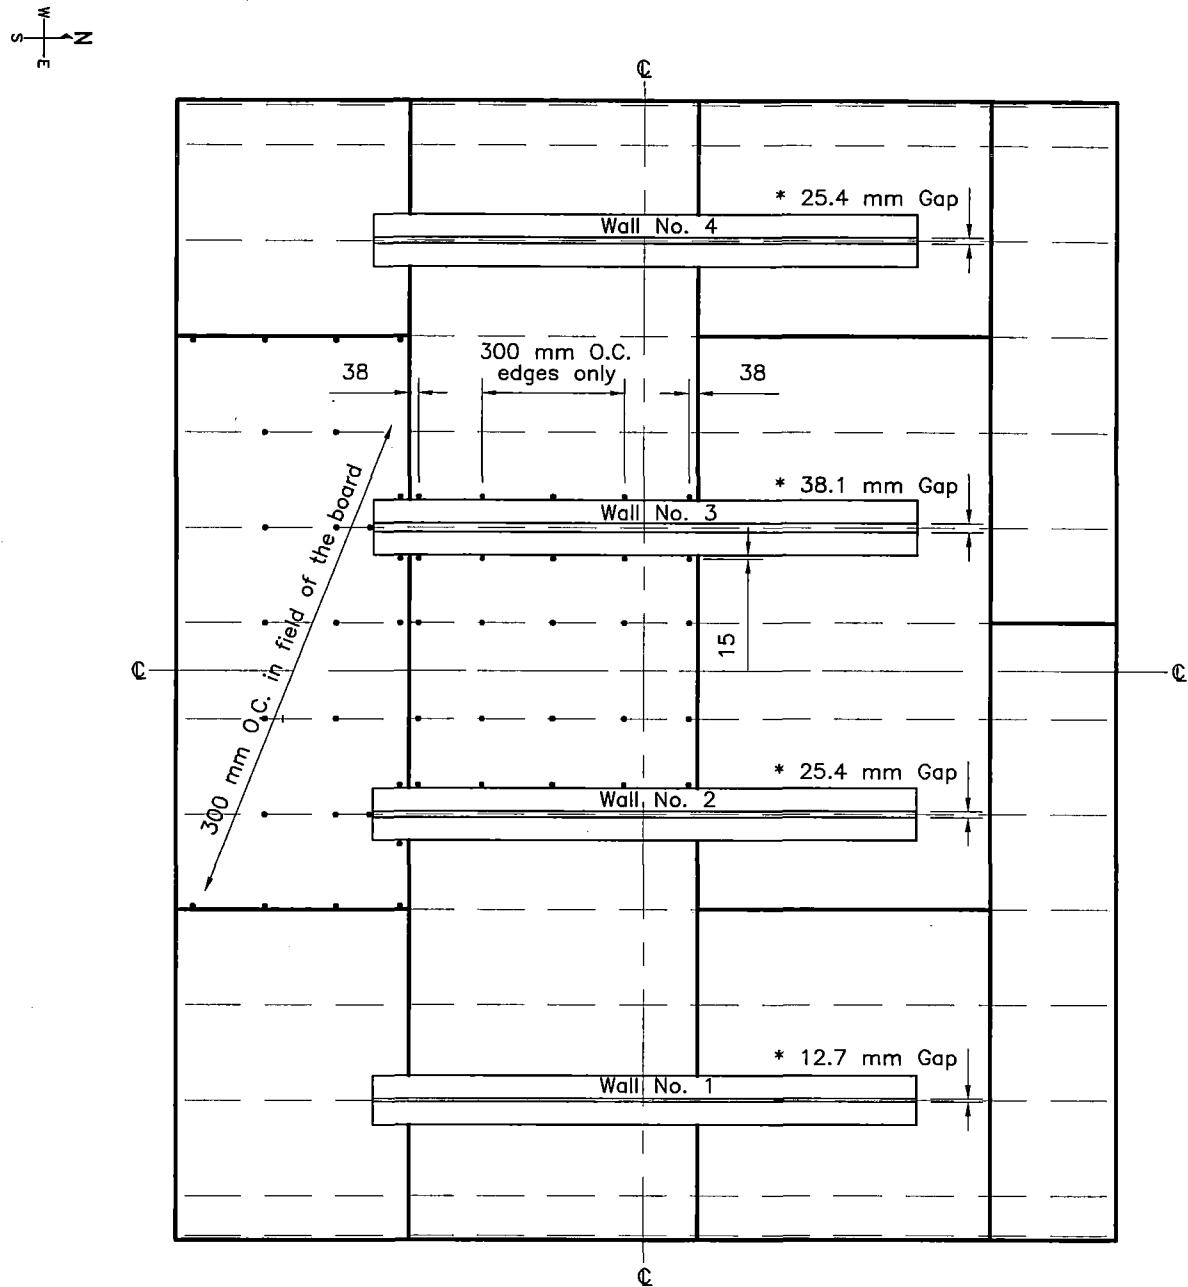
Assembly No. 3, Location of Stud Walls on Flooring System
